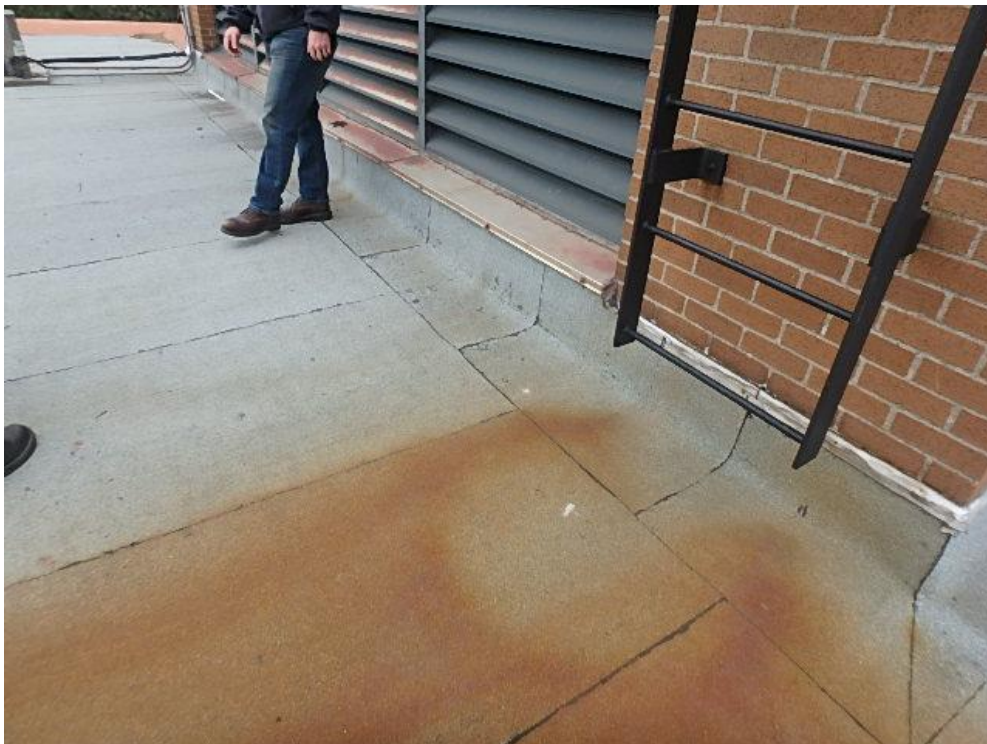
Roof Area 2.2 – Overall view of roof area 2.2 facing north west.
